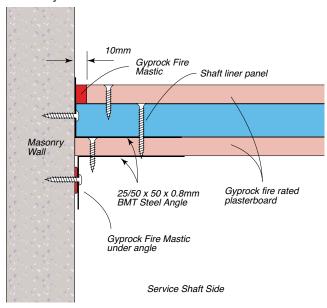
Vertical Corner Abutting a Masonry Wall Detail
